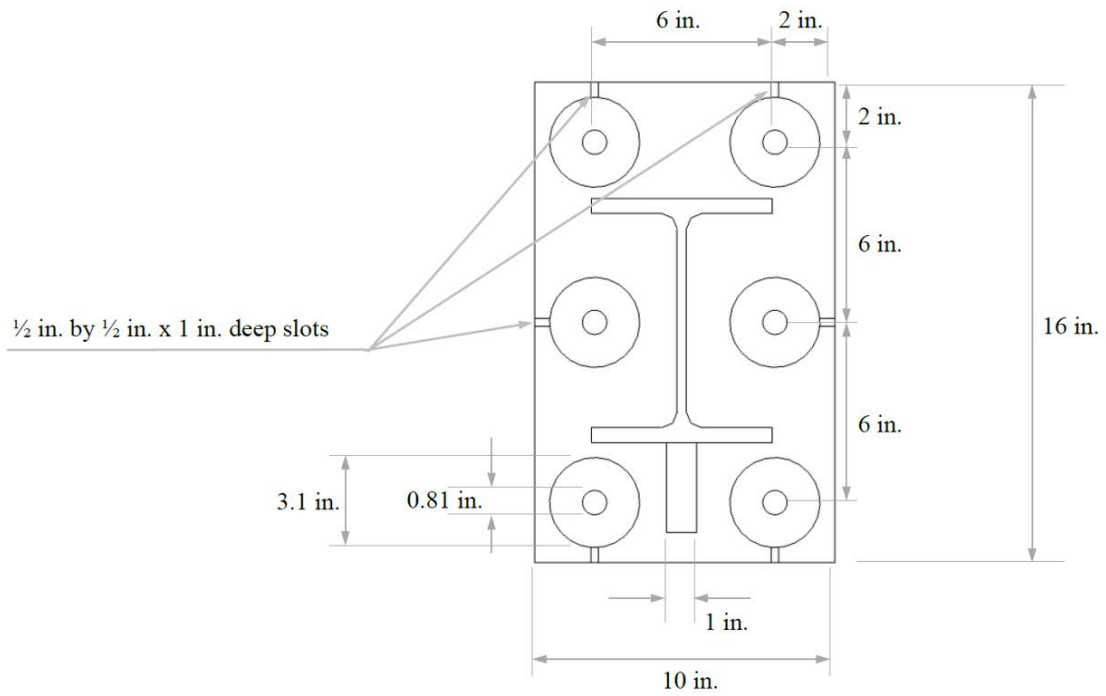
Plan view of Eccentric Shear base plate assembly dimensions
